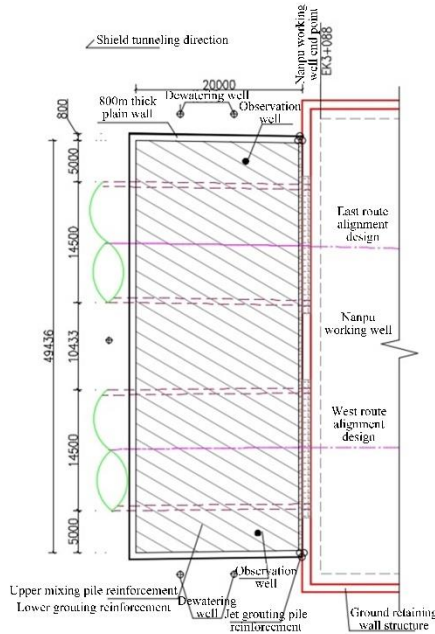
Plan view of the reinforcement at the starting shaft end
